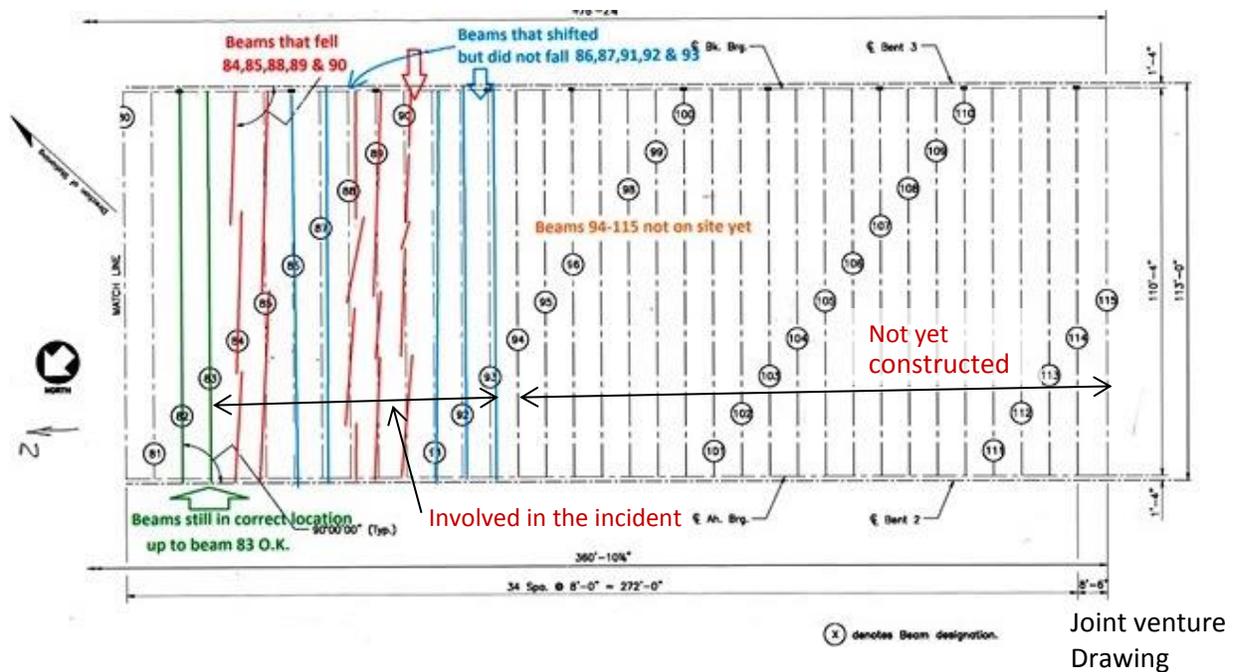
Cell #2 Plan showing concrete beams involved in the incident
